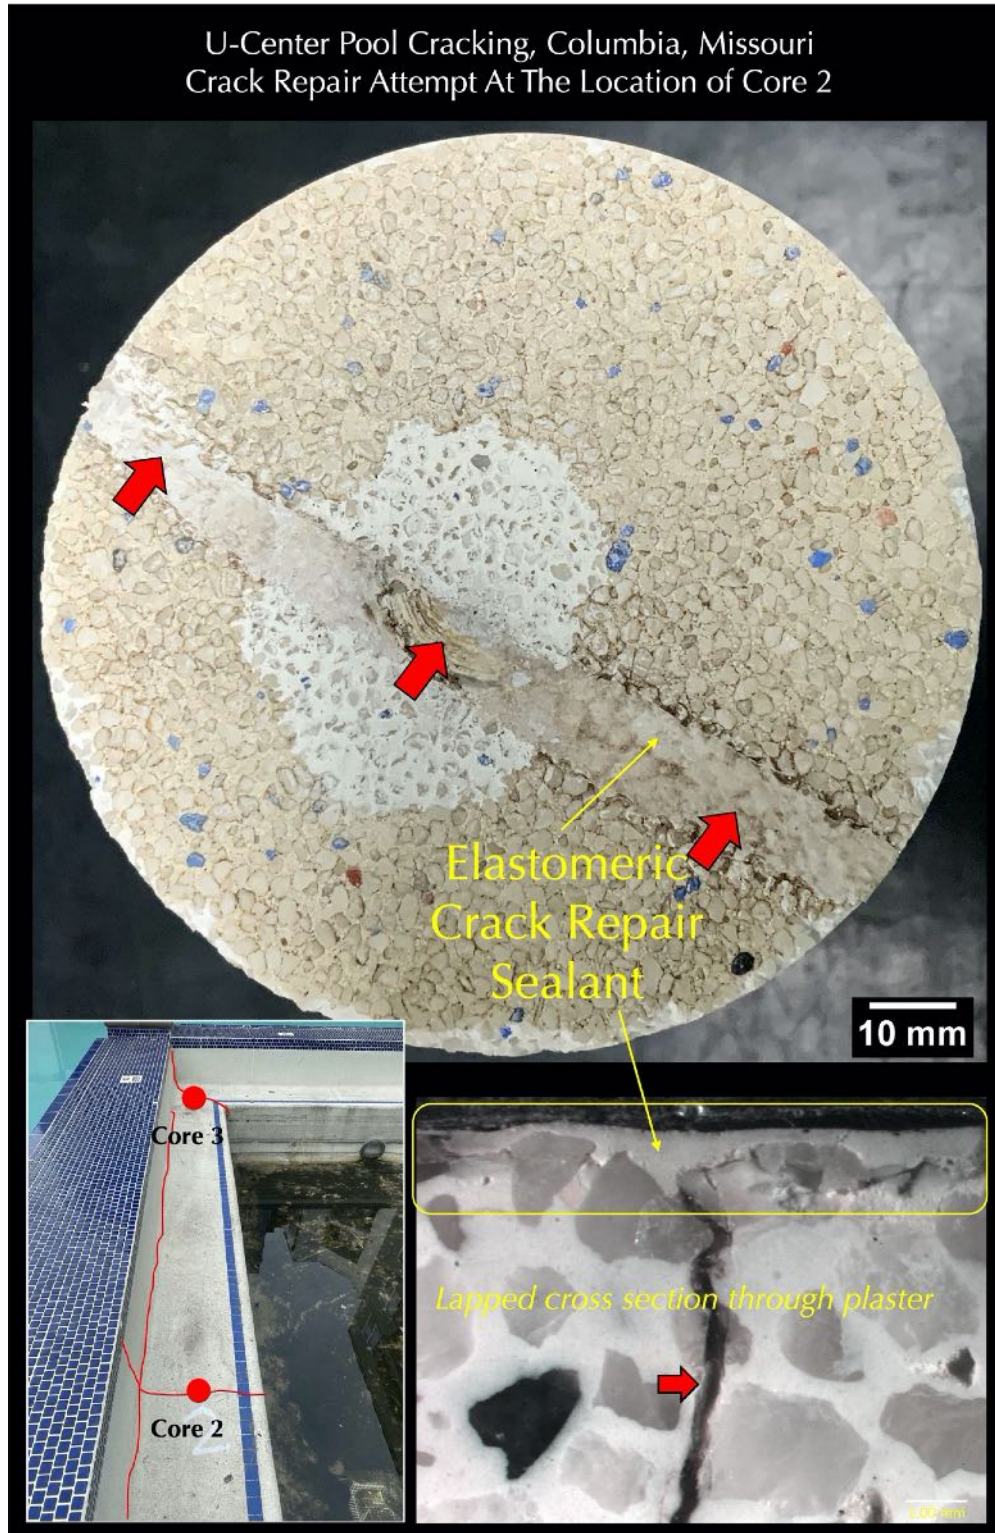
Elastomeric repair sealant on crack at the location of Core 2. Lapped cross section of plaster at the bottom right photo shows an apparent well bond of repair sealant to the plaster at the area of examination but ineffective penetration of crack filler into the crack where most of the crack beneath the sealant/filler is empty.
